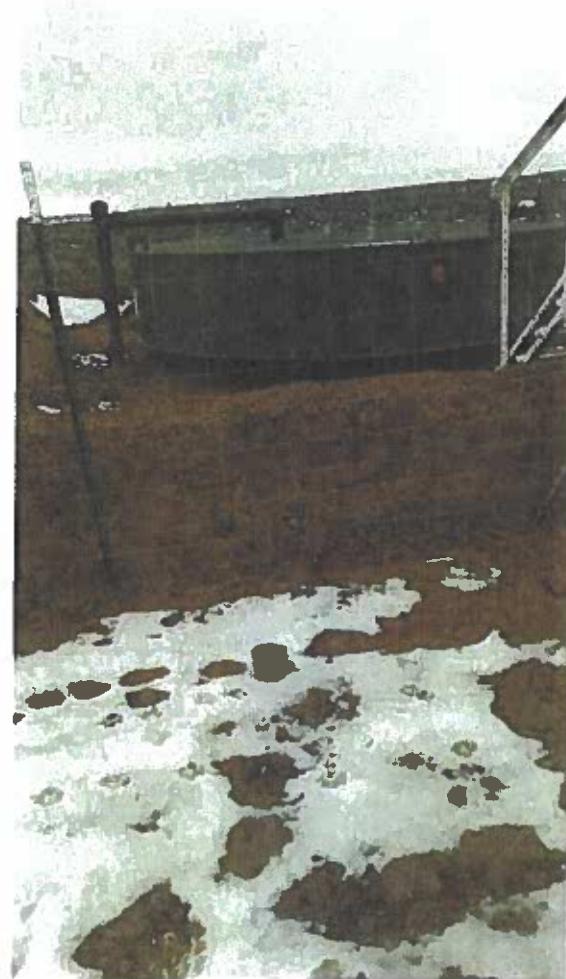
Excavation of surficial soils from separator release. Photo taken December 21, 2018.
